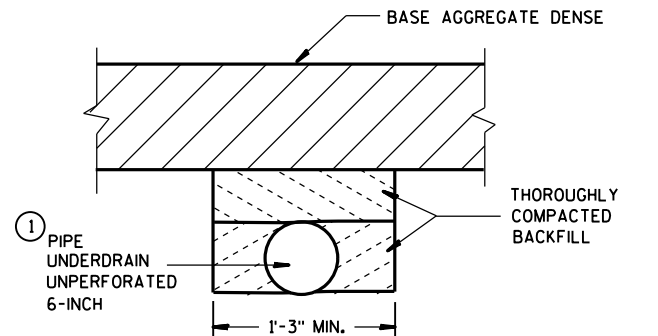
DETAIL "A" TO BE USED AT LOW POINT LOCATIONS
